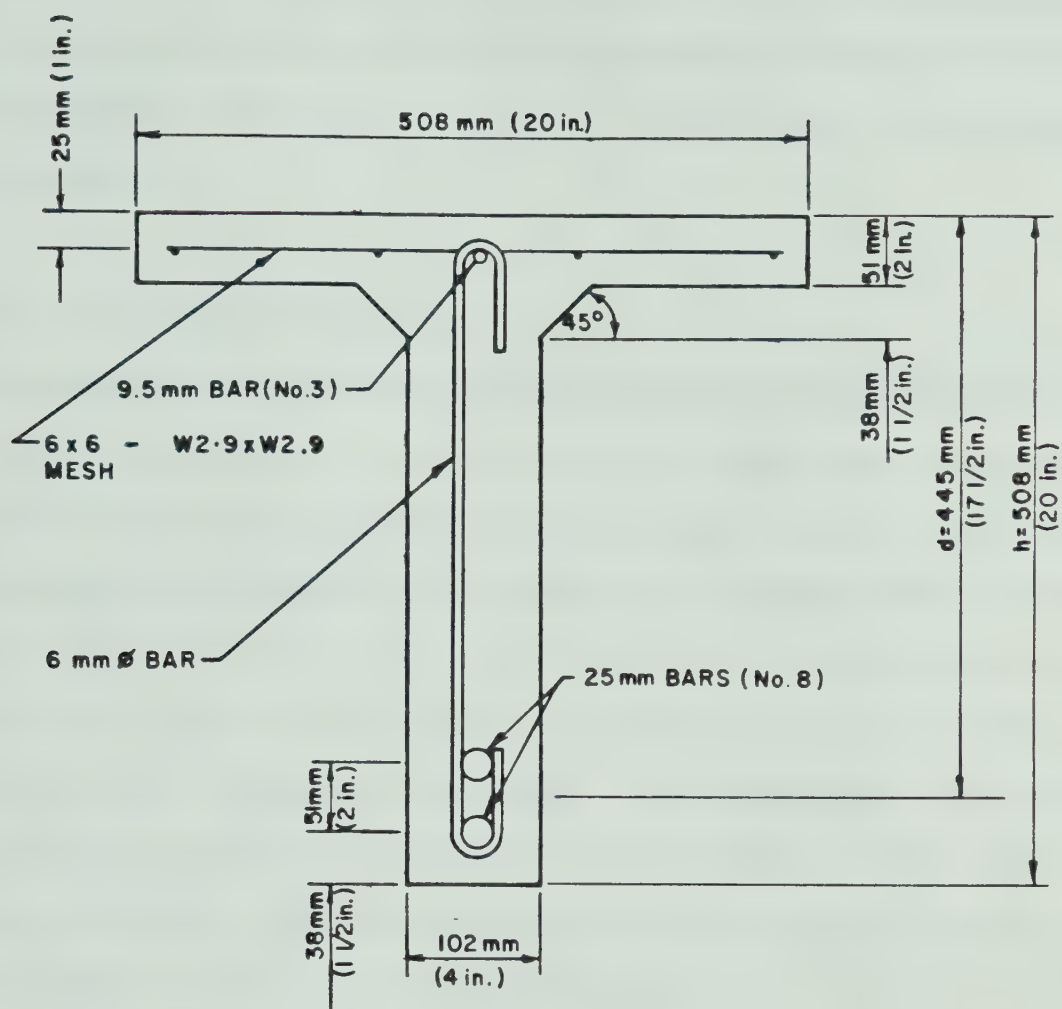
Typical Cross-Section of Beam in Testing Program with Conventional 6 mm Diameter Stirrups
